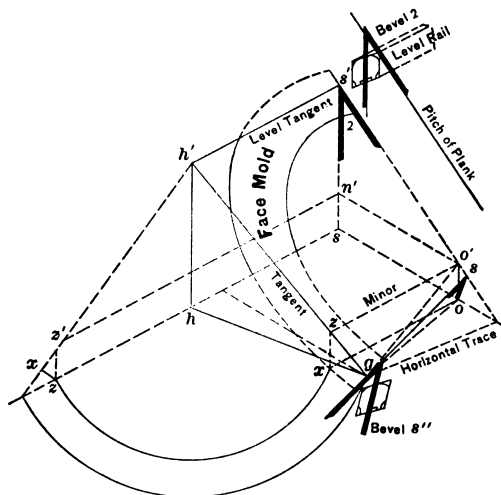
Isometrical View of Block 4, Showing Bevel and Major and Minor Axes.
